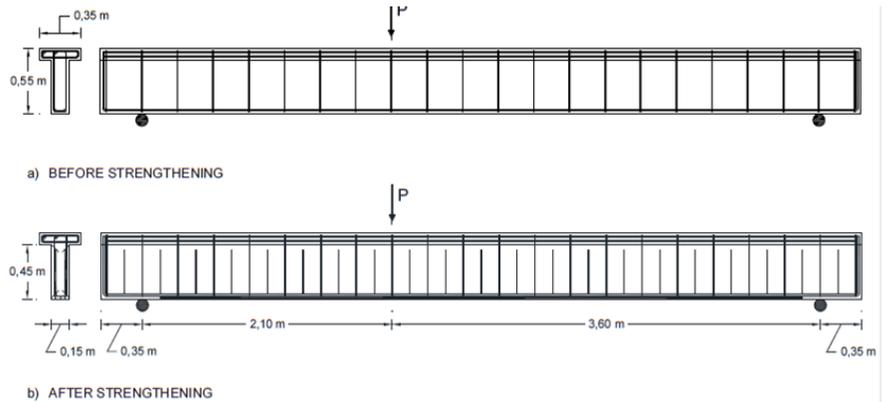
T-beam geometry and steel reinforcement, a) before and b) after CFRP laminate strengthening
